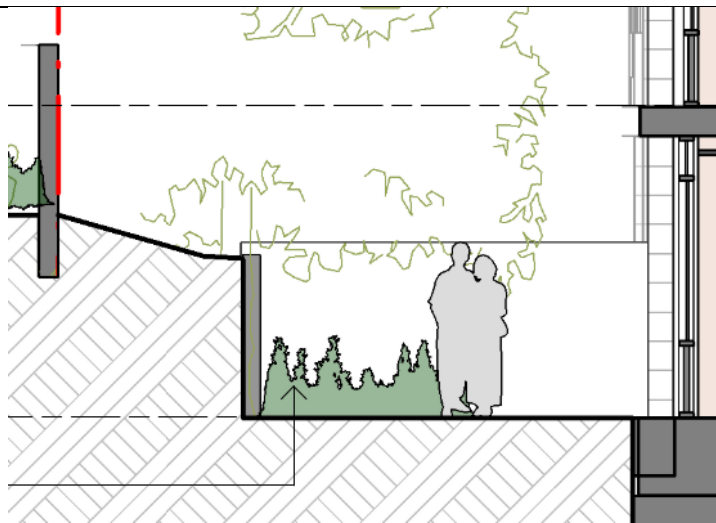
Extract showing high boundary retaining walls (Source: FK Australia)
